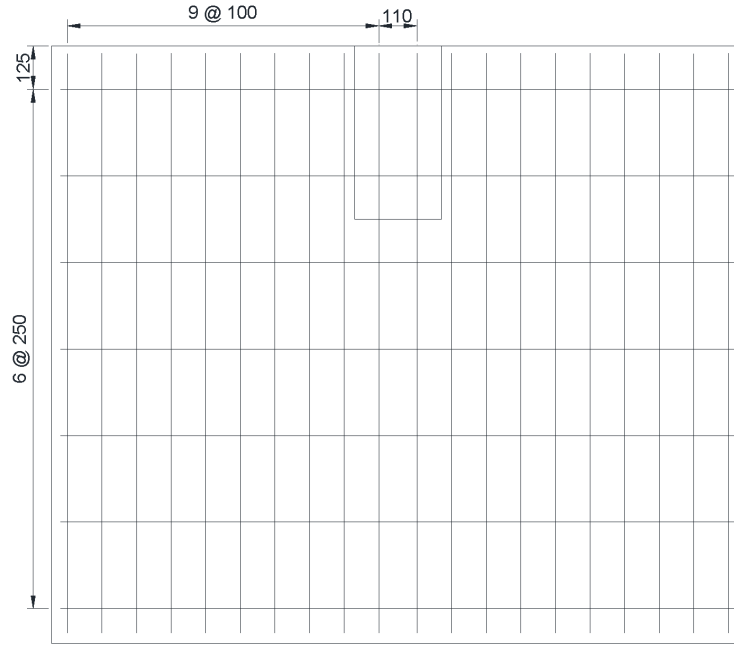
Bottom mat reinforcement details for Specimen 4 (10M bars) (units in mm)
